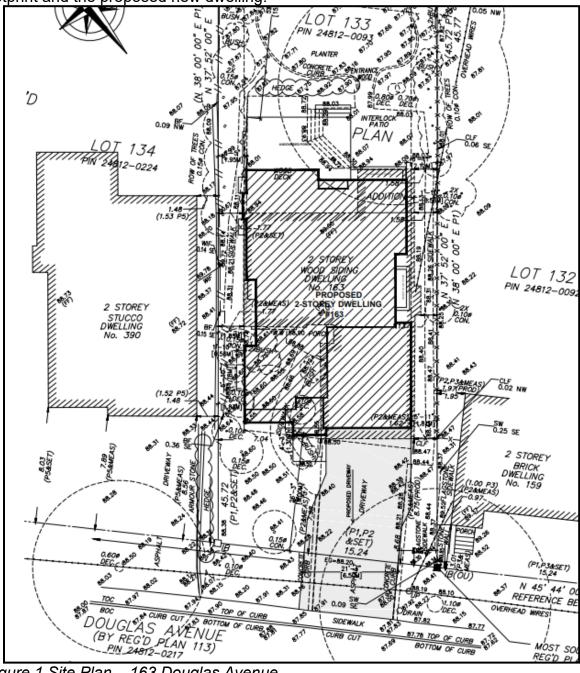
Site Plan – 163 Douglas Avenue 49 of 190
